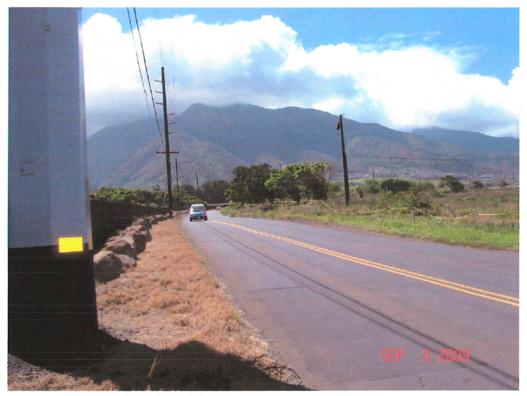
Makai of Honoapiilani Highway Just North of Old Quarry Road Intersection Looking East
